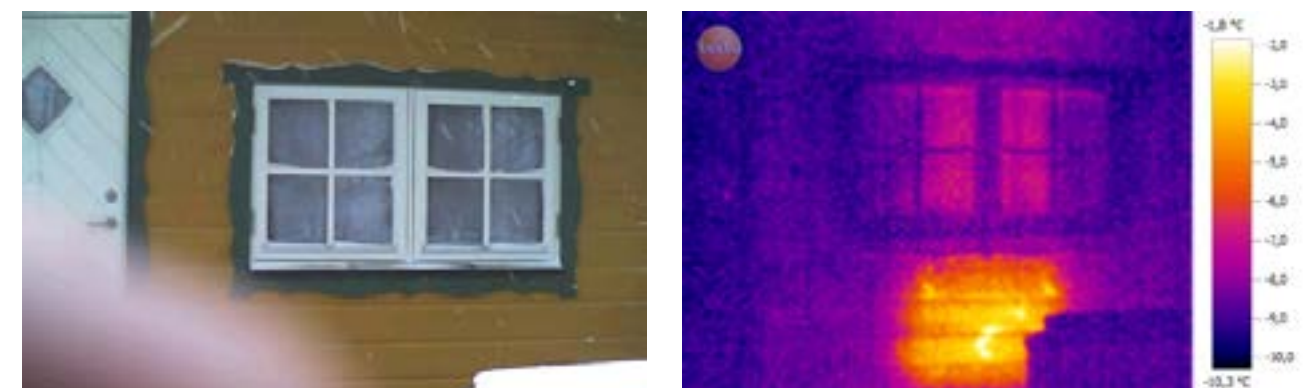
The thermographic camera shows that a lot of heat from the element radiates through the wall. The insulation needs to be improved. Photo: Mikael Nyman
